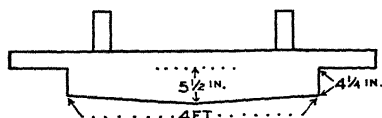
Form used to convert existing flat-bottomed wooden or concrete benches into a modified V bottom
